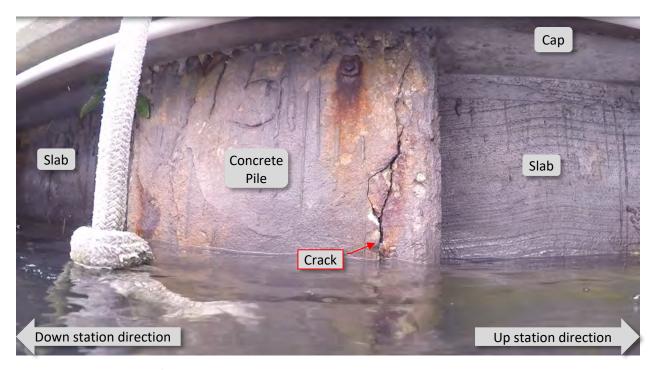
P1. STA 1+23. Crack/spall on pile and corroded anchor bolt. TYPICAL seawall components and direction is shown.
